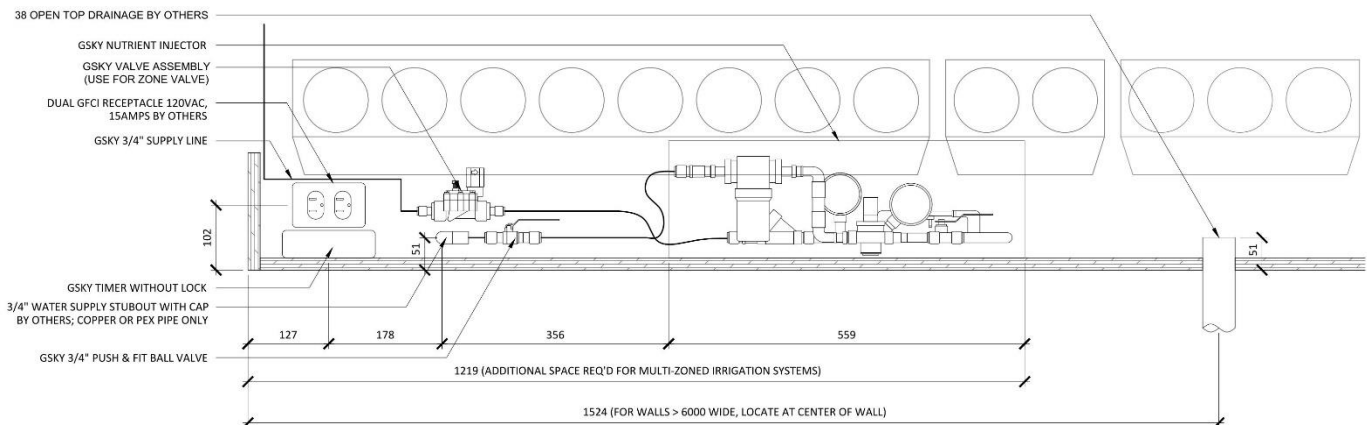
Versa Wall Above the Floor/ICU Below Wall VTI-70 Elevation of Irrigation Layout. Versa Wall CAD & Specs. (2020, March 2). Retrieved from <https://gsky.com/versa/cad-specs/>
